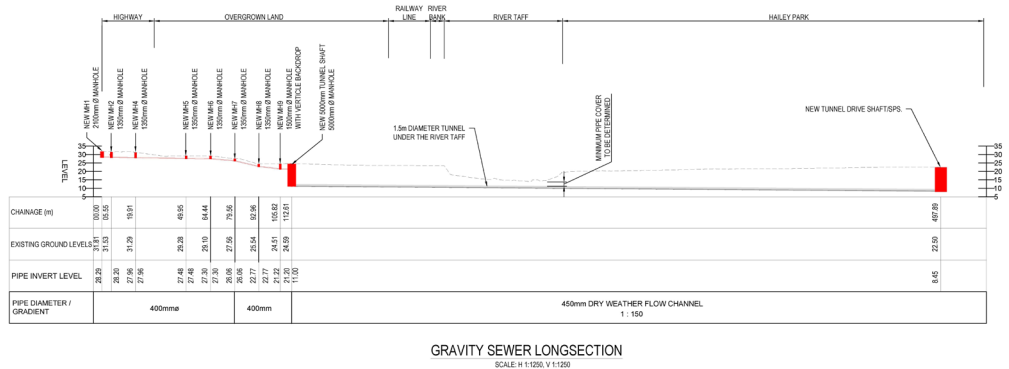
Gravity Sewer Section – De Braose Close to Hailey Park
